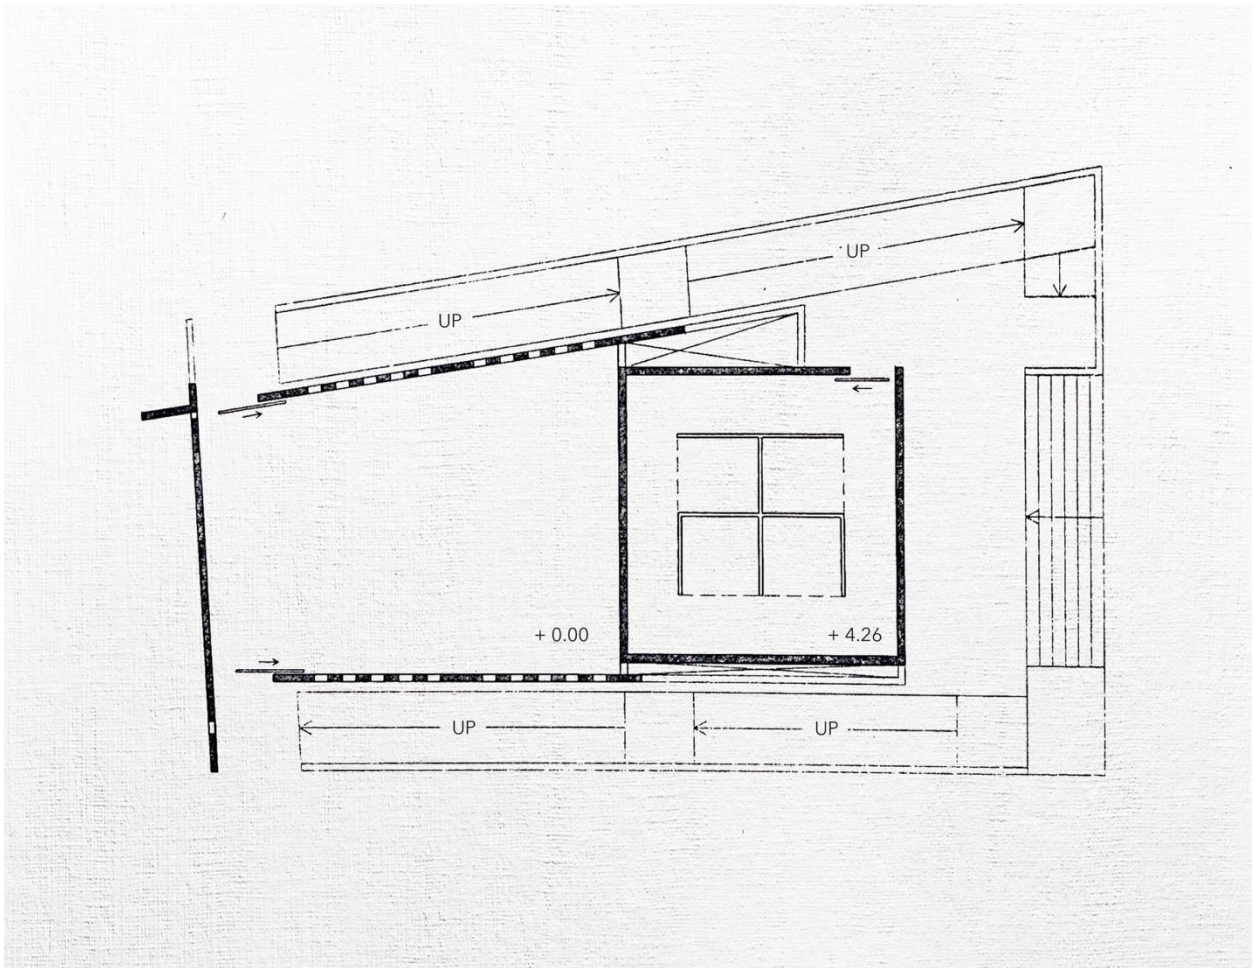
Image by Constanza Loustalet. First/Second Floor Plan. 2020.
